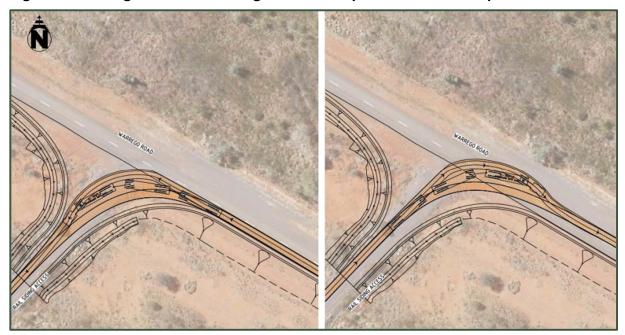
Warrego Road/Rail Siding Access – Triple Road Train Swept Paths
